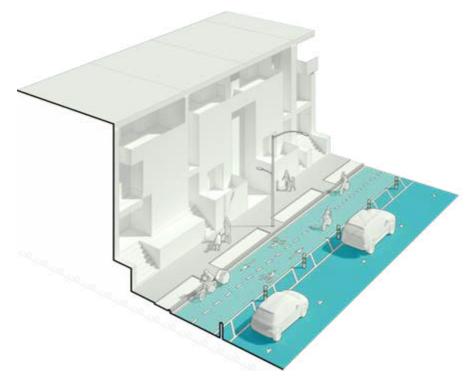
Two-Way, In-Street Class IV Bikeway, on the Left Side of a One-Way Street, Adjacent to On-Street Parking, Protected by Bollards and On-Street Parking.
